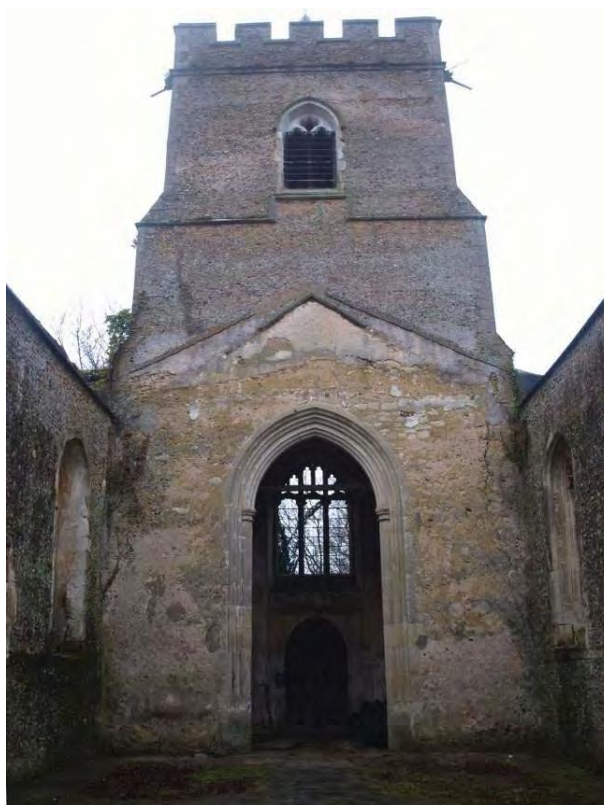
West end of the Nave and east elevation of the tower showing previous nave rooflines.
